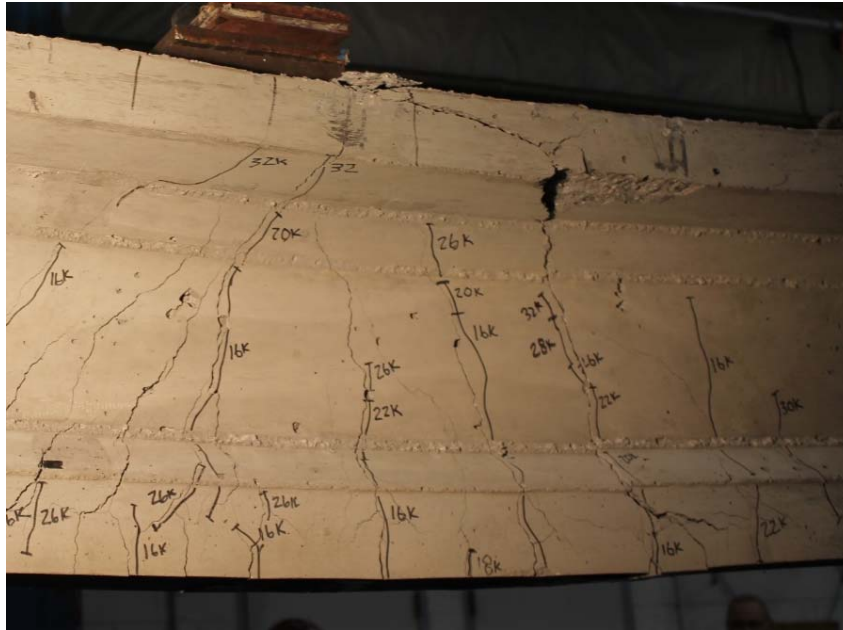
Compression Failure of Specimen 1 Typical Steel Reinforcement
